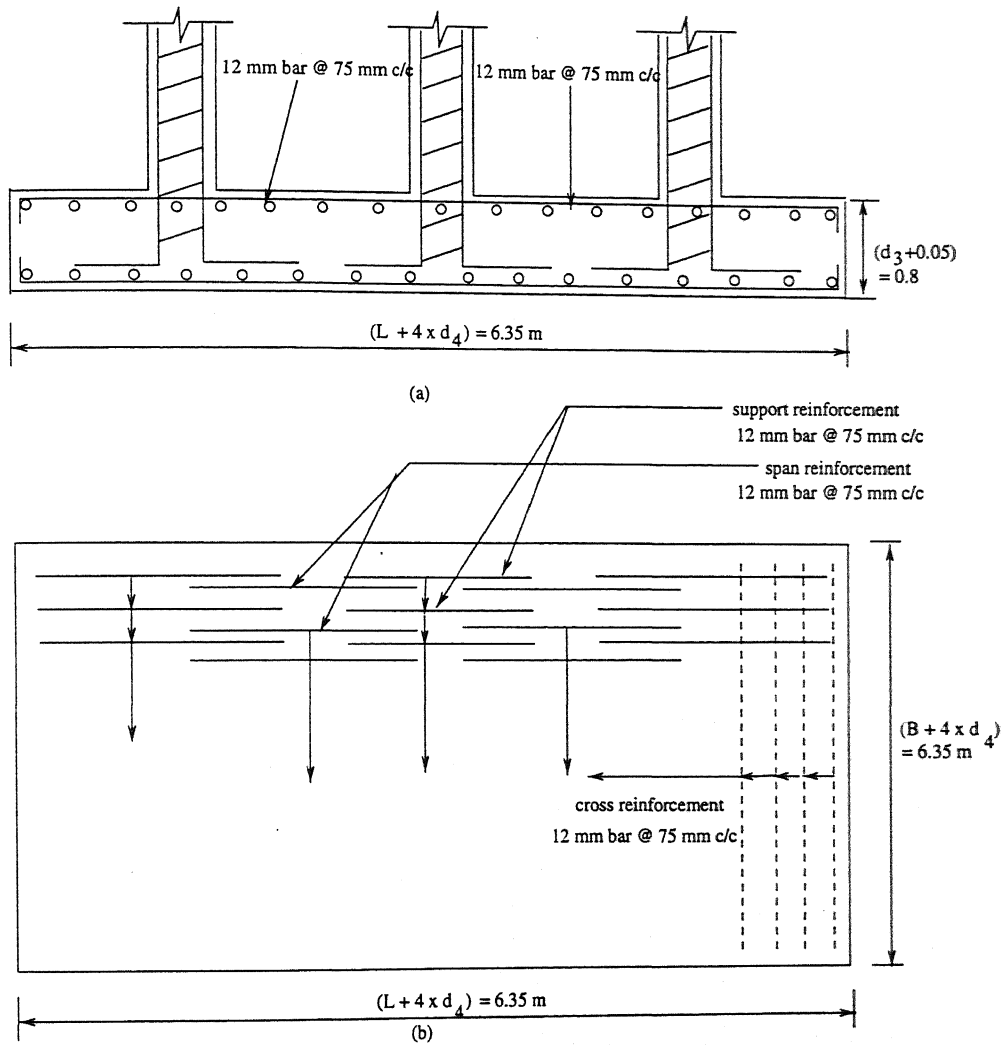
Reinforcement detailing for a raft, (a) sectional view, (b) plan
